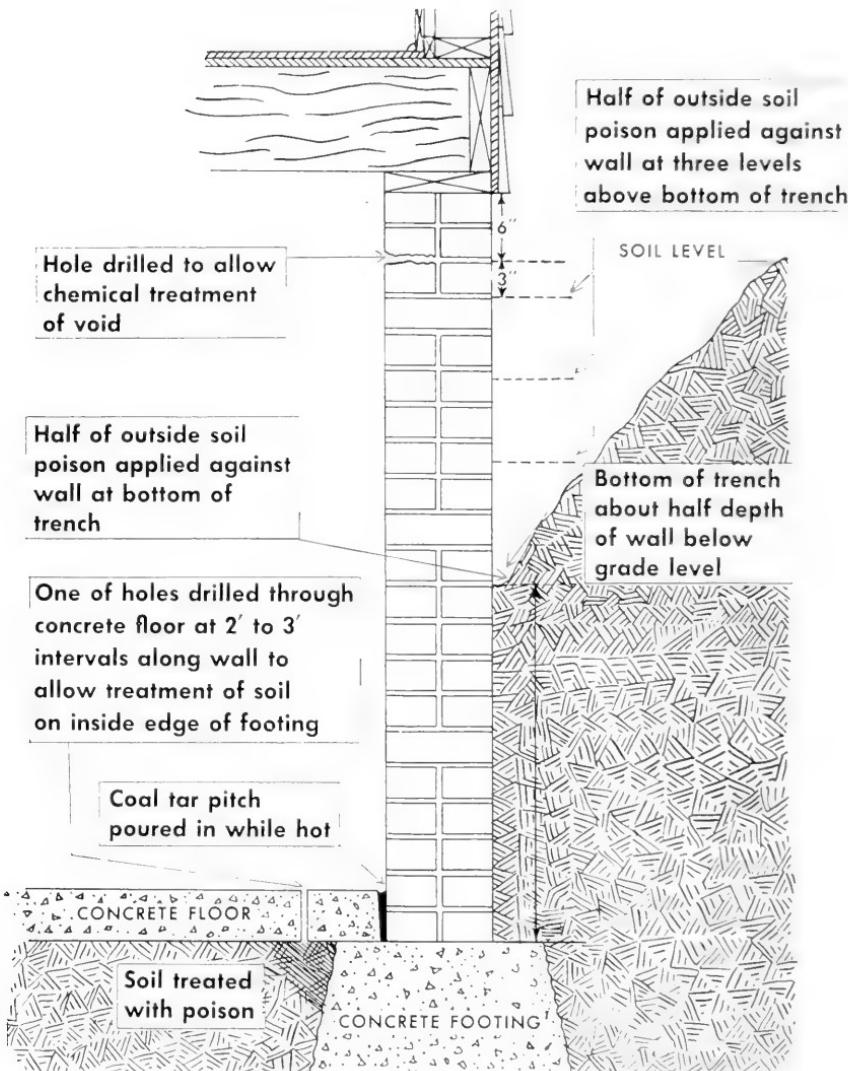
Cross section of a foundation wall showing where outside soil poison should be applied. A trench is dug along the entire length of wall to allow treatment of adjacent soil. The depth of the foundation and the type of soil will influence the depth of the trench and the number of levels at which the chemical should be applied for thorough penetration. Clay soils require deeper trenching and applications at more levels than more porous soils. Chemicals should not be applied to wet or frozen soils. Foundation walls with voids, and also floors through which termites might enter the walls, should be chemically treated, figs. 24 and 27. It is seldom advisable to go to the expense of installing a shield on a building that has been chemically treated.
